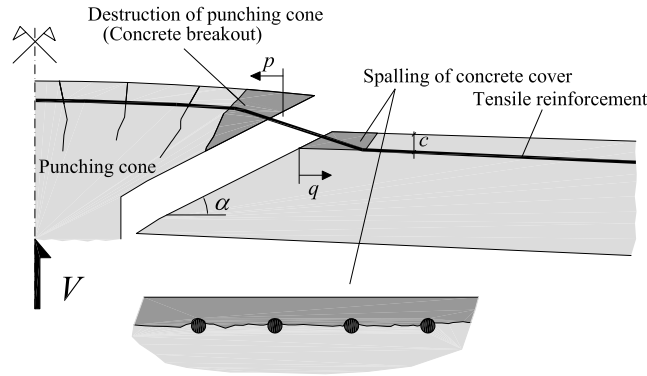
Concrete breakout and spalling in the post-punching phase
